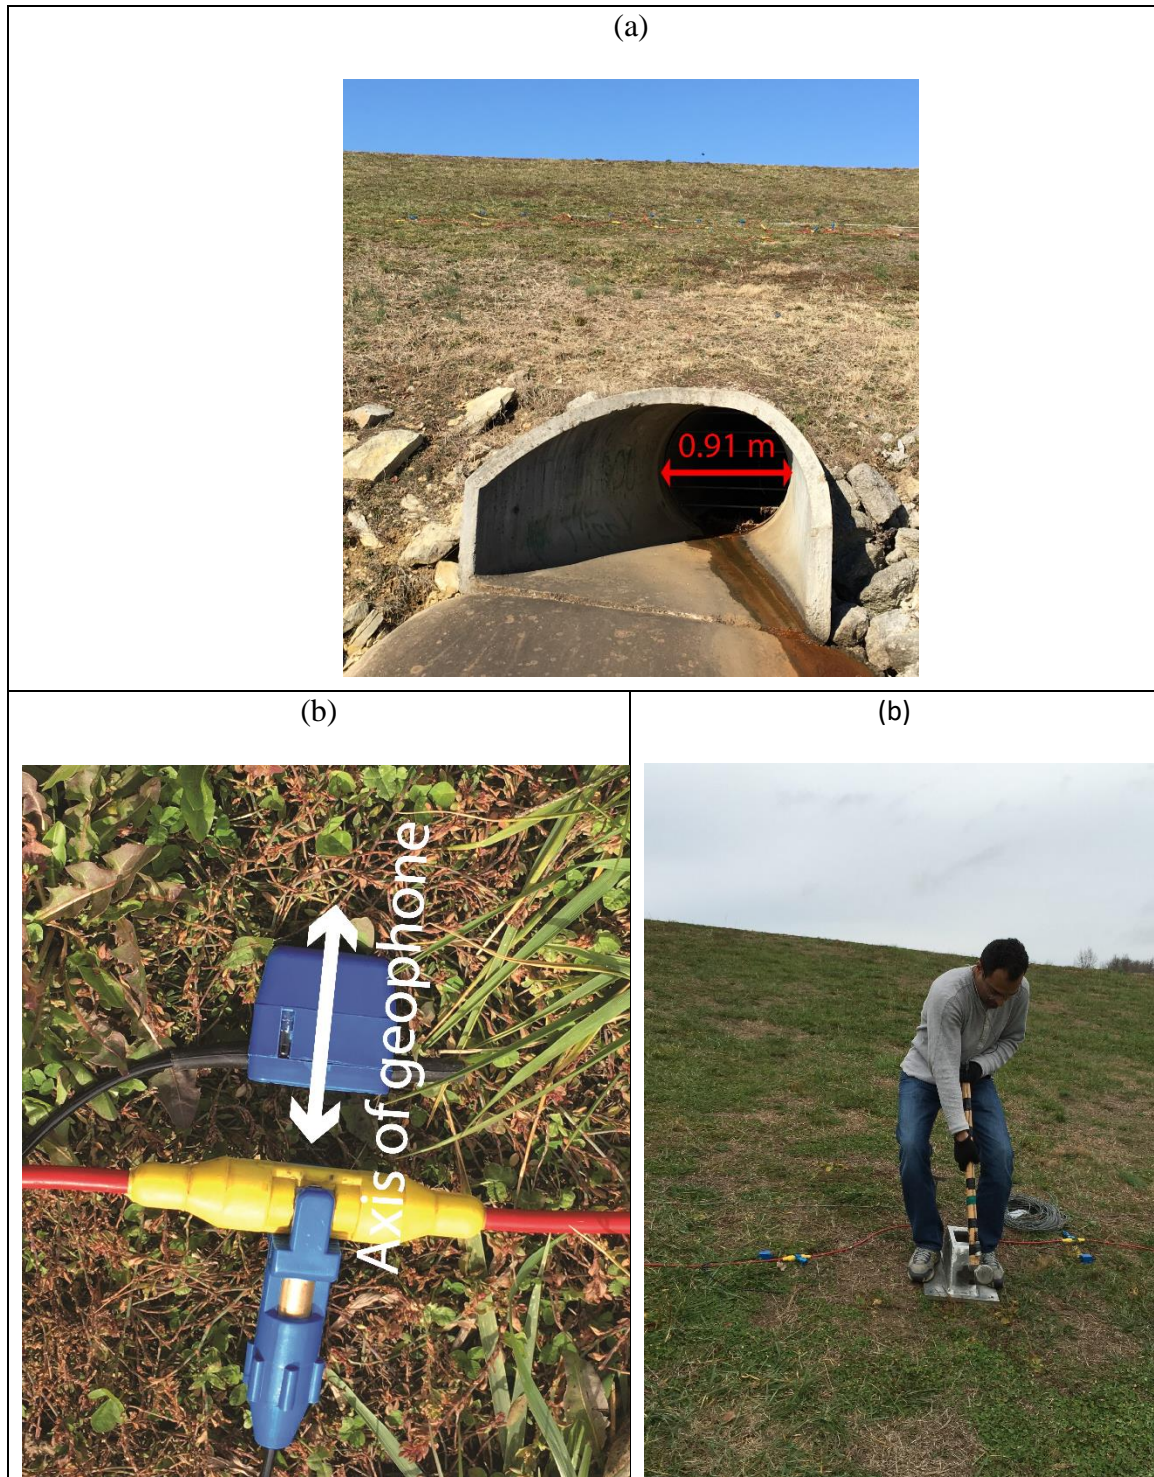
(a) Downstream outlet of the concrete conduit lying beneath an embankment dam. (b) Horizontal geophone. (c) Application of shear energy source.
